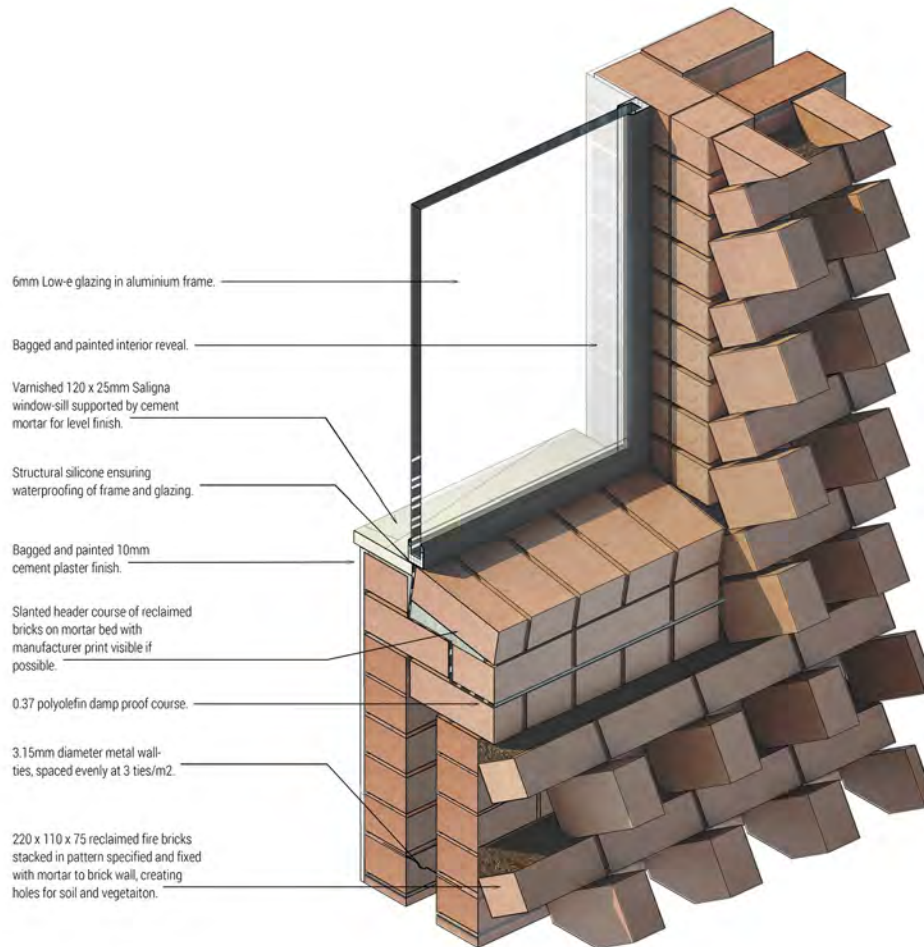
Three-dimensional detail drawing of planted wall built from reclaimed bricks found on site (Author, 2017).
